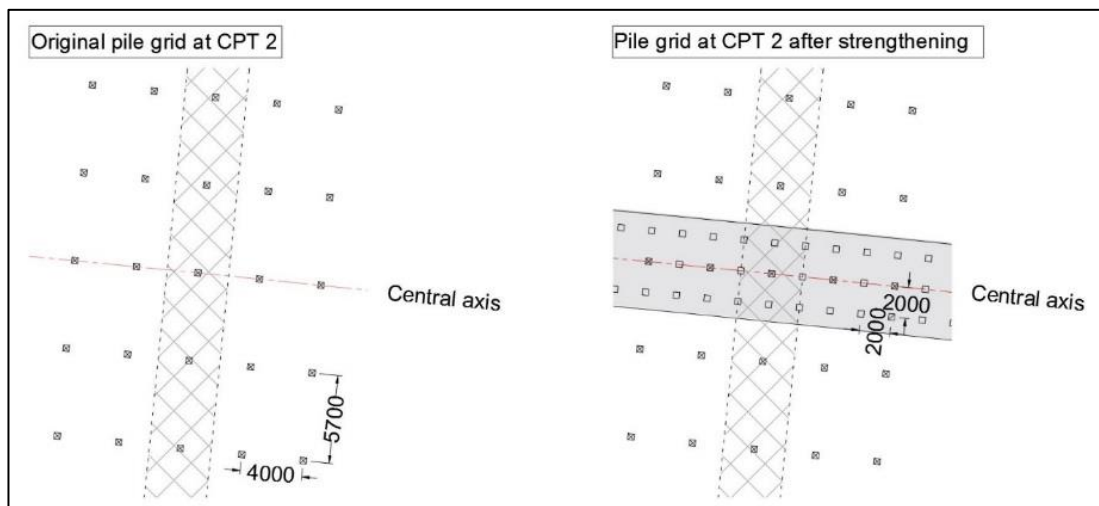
Two schematizations of the pile grid at CPT 2; the existing foundation (left) and after strengthening (right).
